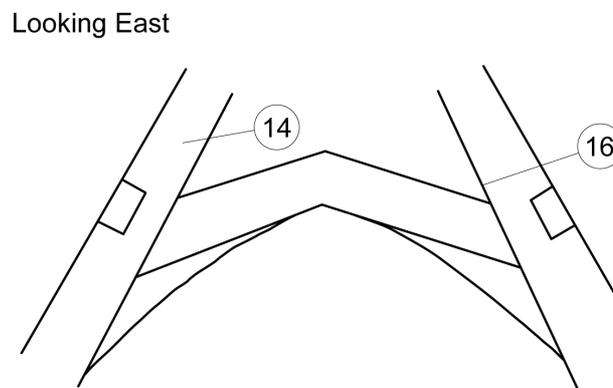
Sketch showing the location of samples SWM-F14 and SWM-F16 from truss B in the hall range roof
